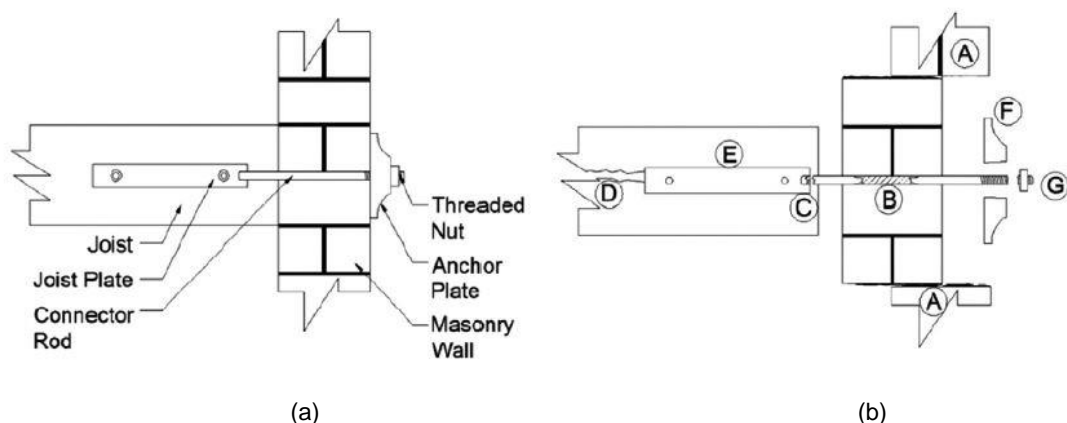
wall diaphragm anchor plate connections, (a) connection detail, (b) location of failure modes (Campbell, J et. al, 2012)
